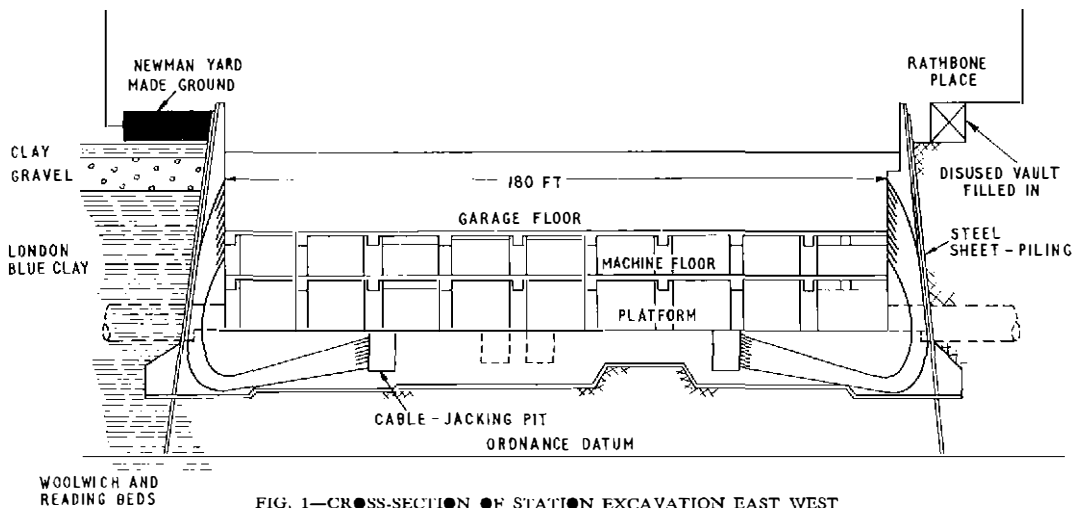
CROSS-SECTION OF STATION EXCAVATION EAST WEST
